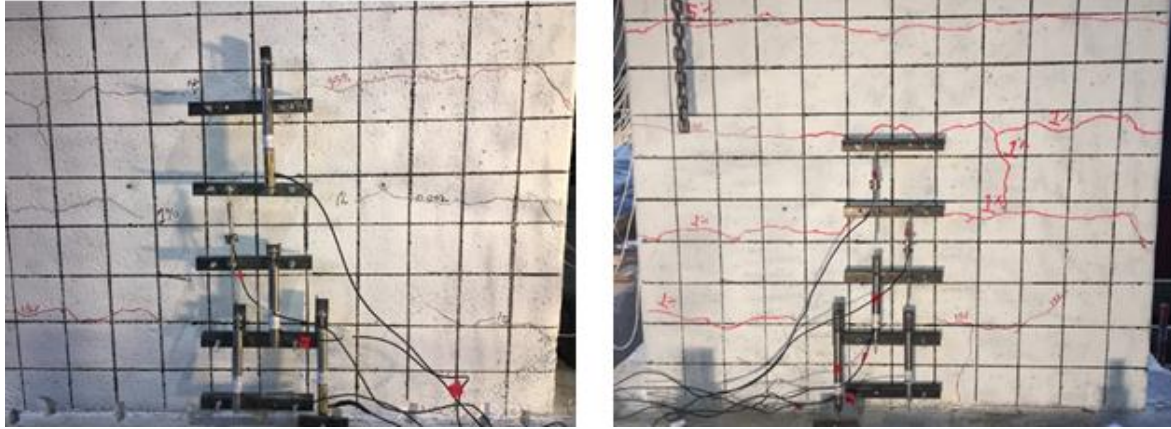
Cracking at 1.5% drift: (a) West facing side (b) East facing side
